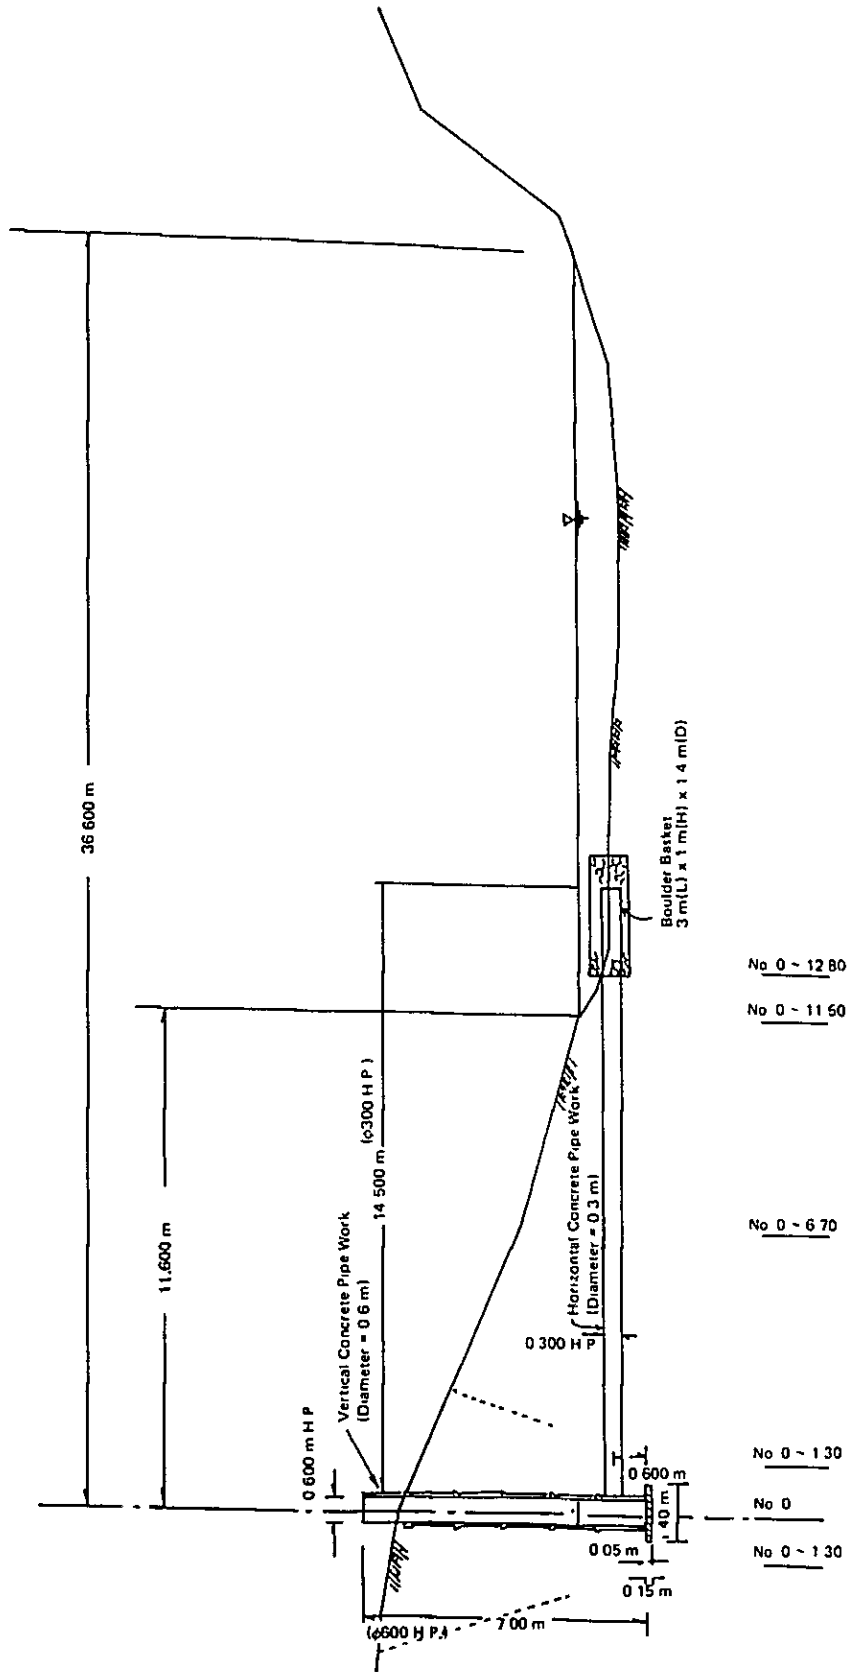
Profile of Water Gage Installation at the Yabebyry River
